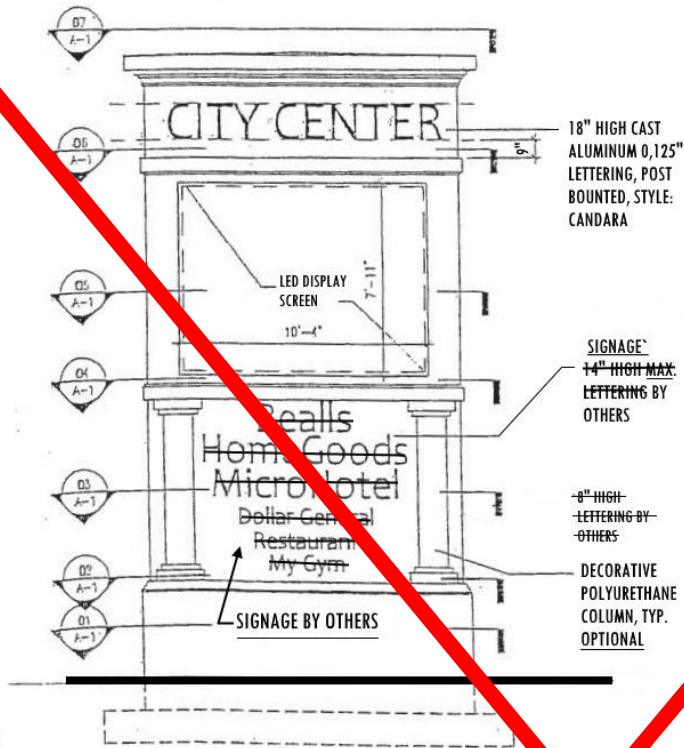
Existing Primary Monument Sign at Corner of US #1 and Walton Road.
